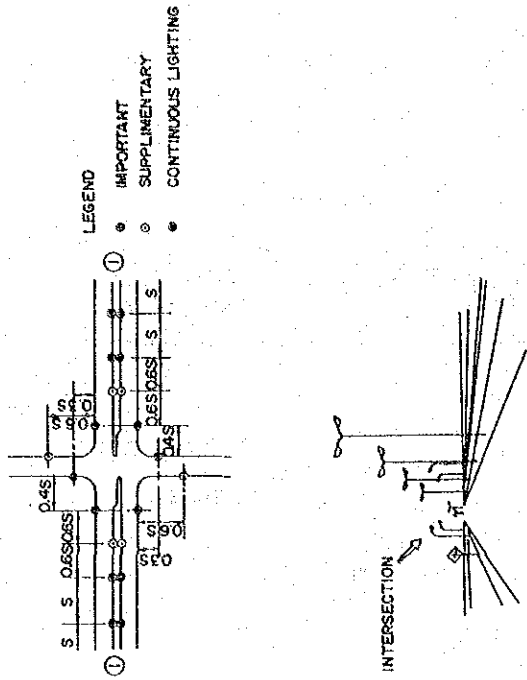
Typical Luminaire Arrangements (Indication of Intersection)
